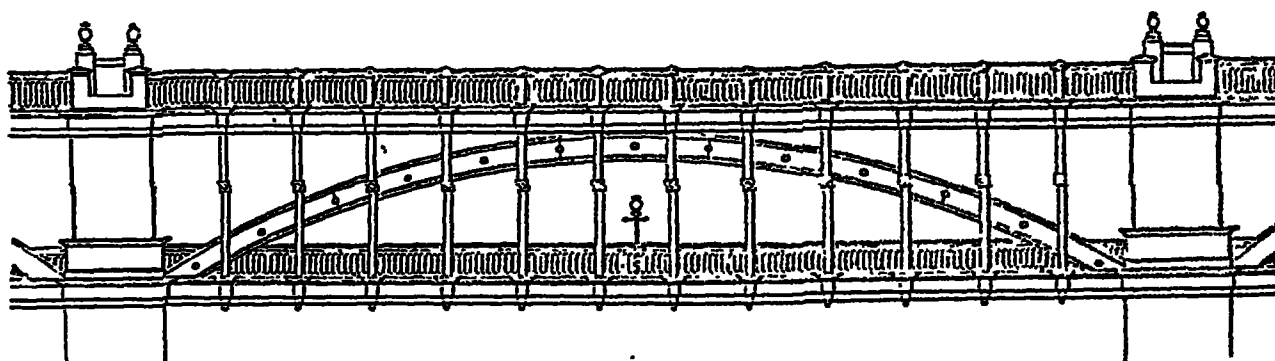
Elevation of Bowstring Arch, High-Level Bridge, Newcastle
